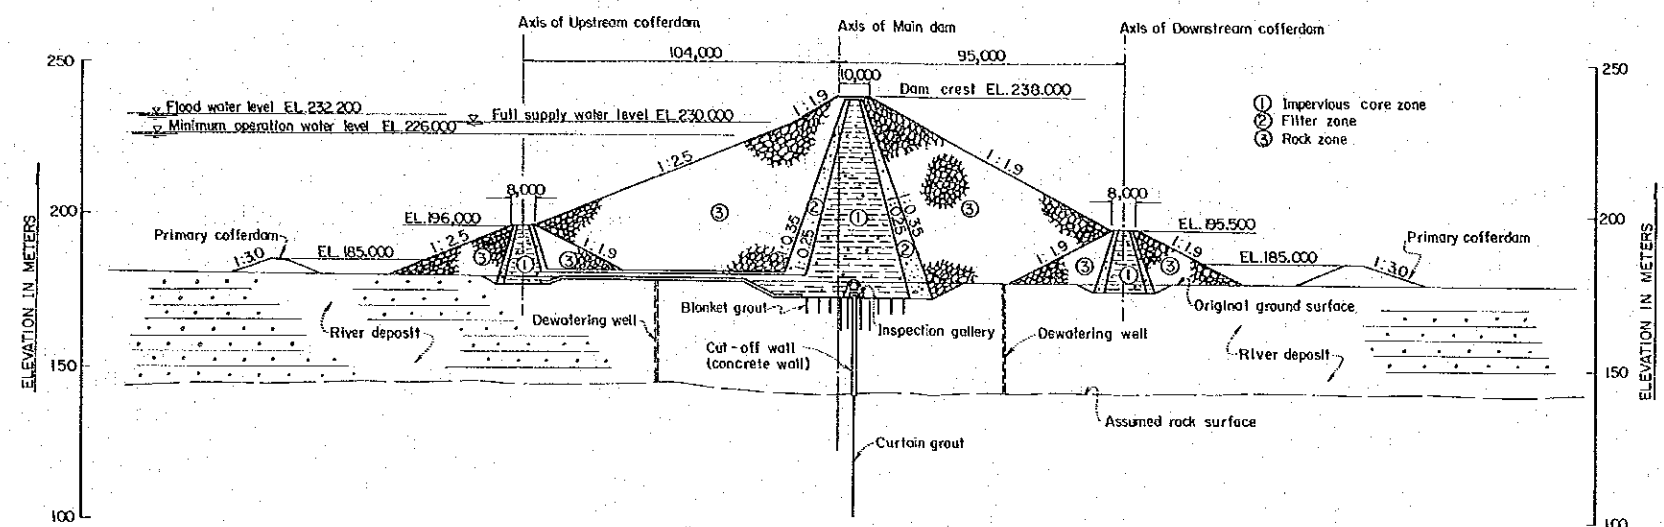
GENERAL PLAN(SCHEME : FILL DAM, DAMSITE-B, F.S.L 230, 225MW INSTALLED CAPACITY)
